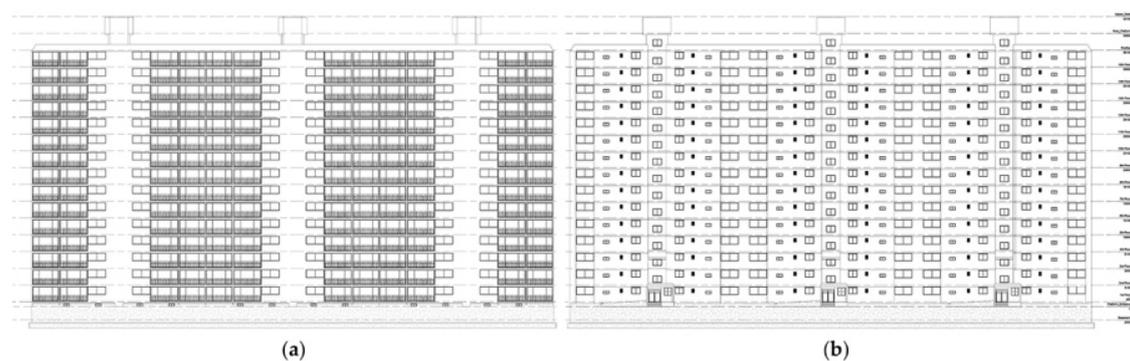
BIM reconstruction of the standard apartment unit in building 103: (a) south façade and (b) north façade.
